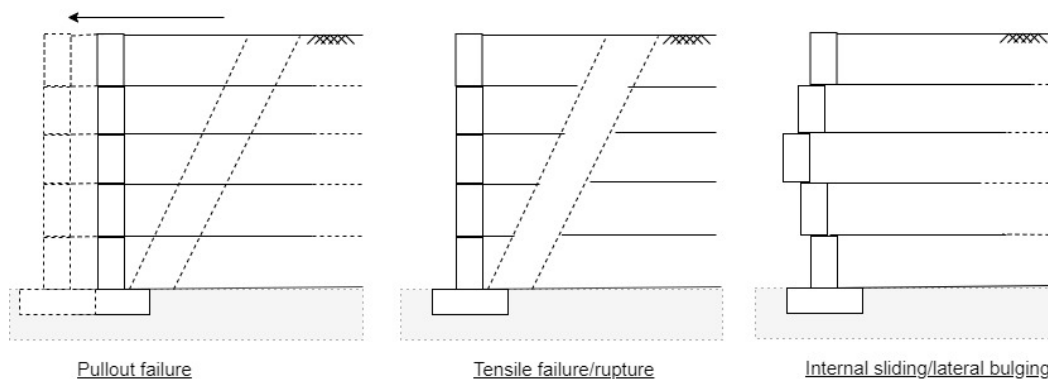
Modes of internal failure of a reinforced soil abutment
